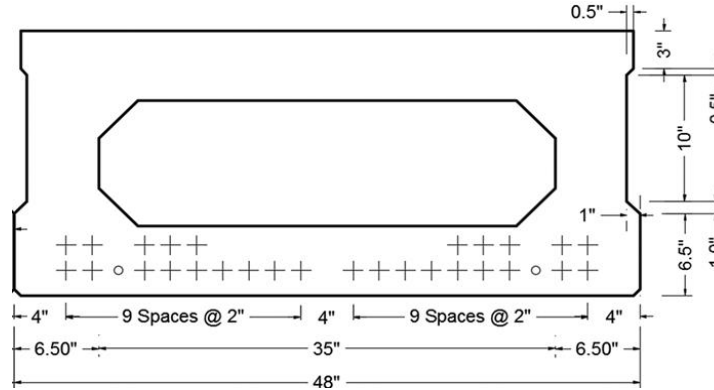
Revised Cross Section of B21-48 Box Beam that was Used in the Implementation Project
